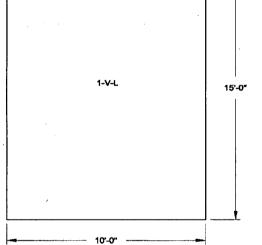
H.8-205: WALL 18 LOOKING FROM OUTSIDE VERTICAL REINFORCEMENT ZONES
